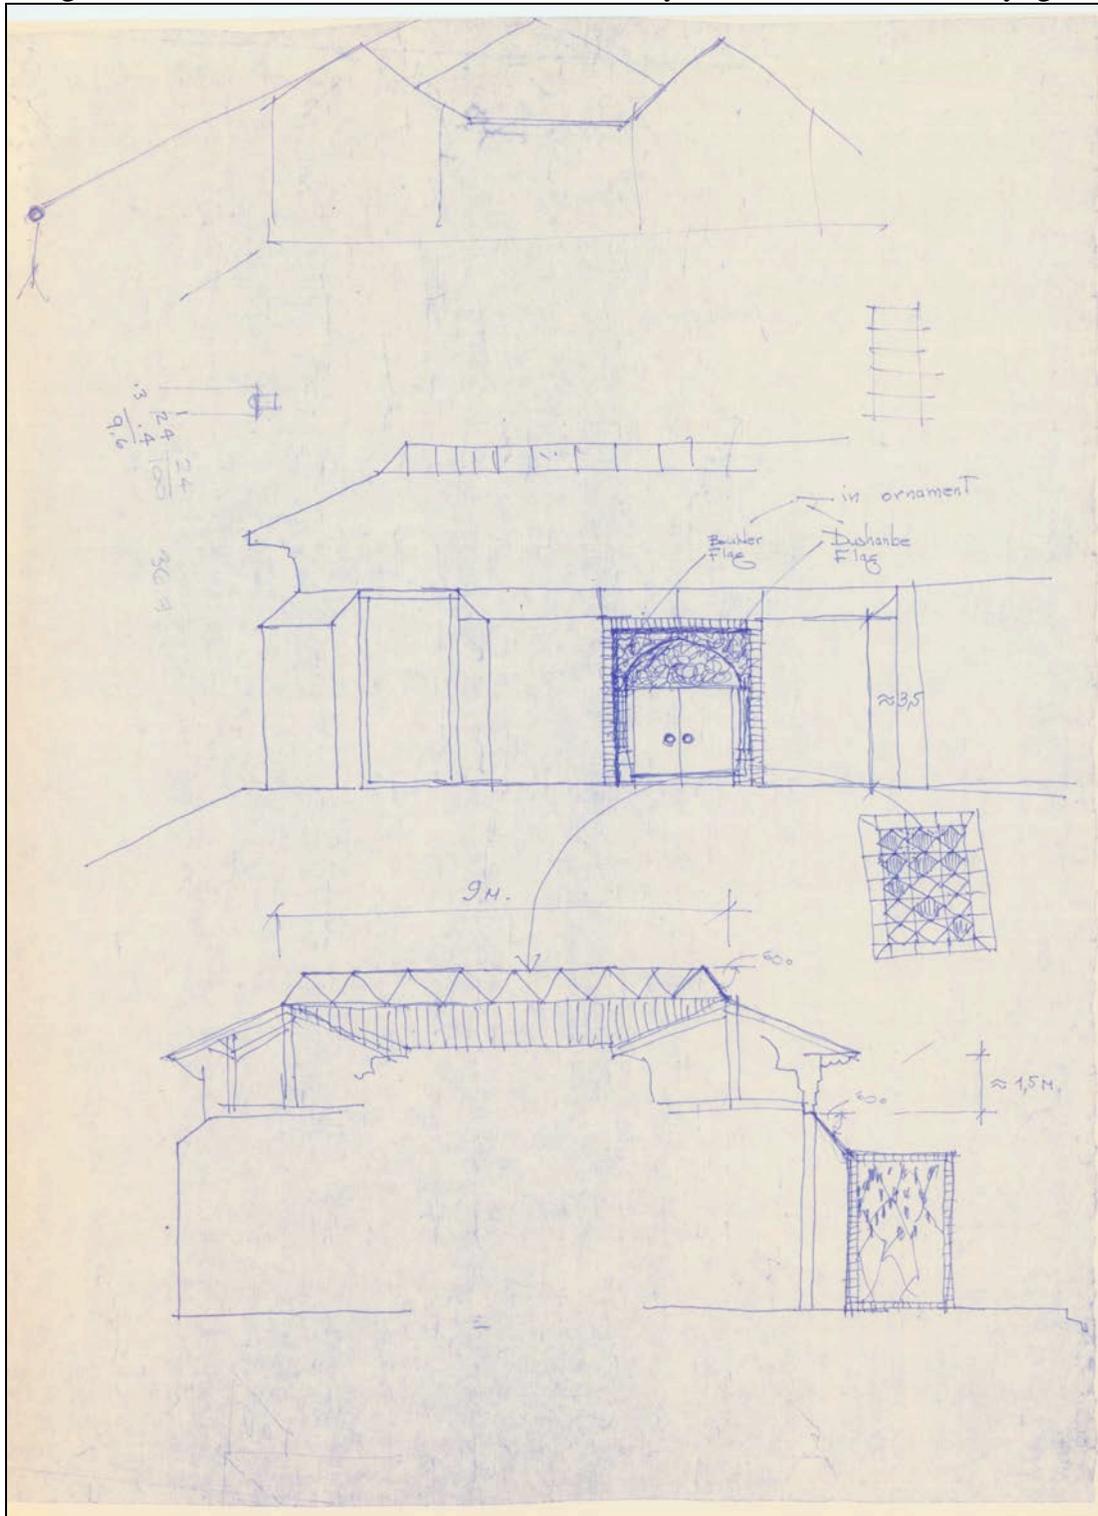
Architect Lado Shanidze's Sketch 2, Building Elevation and Section, 1989
